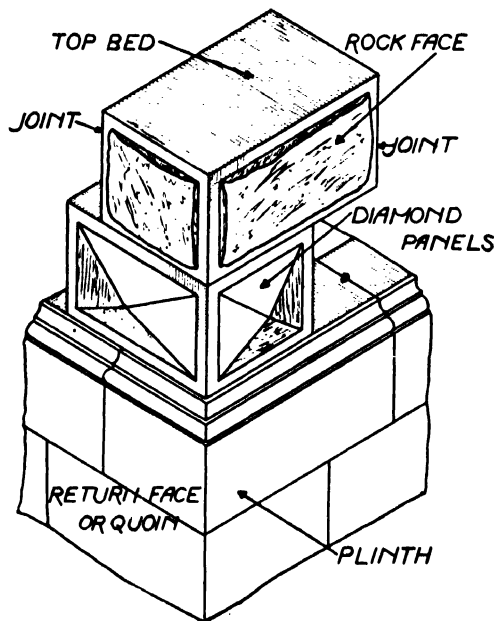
SKETCH OF ANGLE OF BUILDING. SHOWING MOULDED PLINTH AND QUOIN STONES. Finished with diamond panels and rock face chisel drafted
